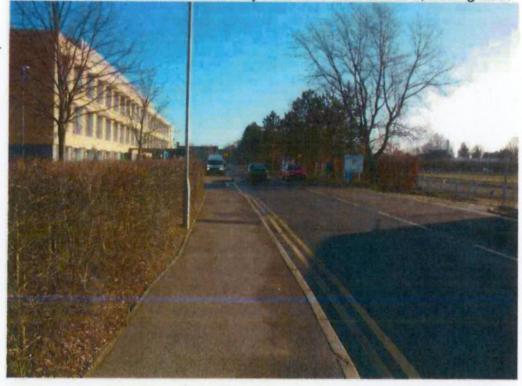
Looking North from Point H, new Footway alongside Francis Crick Avenue
